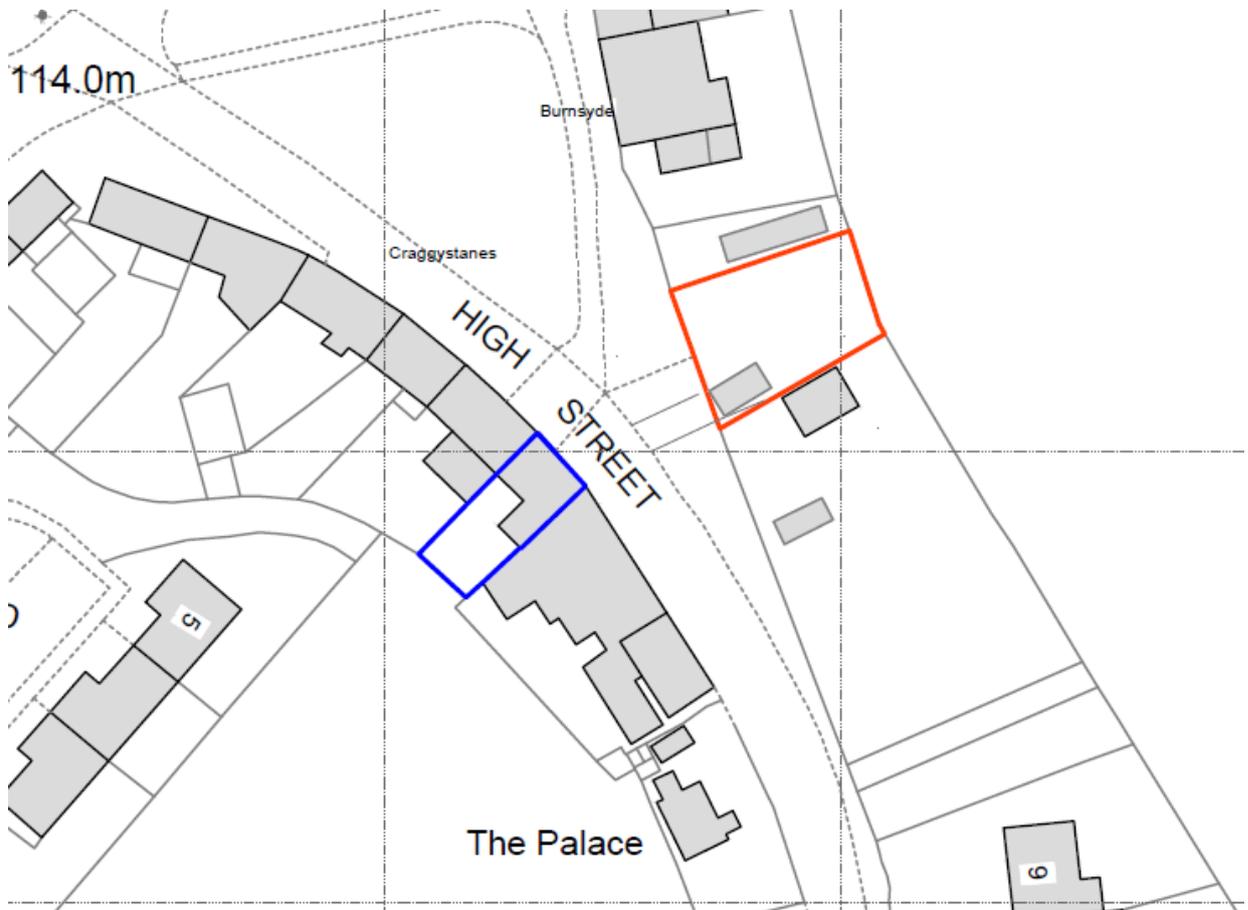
Extract from AH073-P03(B) Location Plan, High Street and the Applicants' home are visible to the west of the site (Source: Aidan Hume Design)
